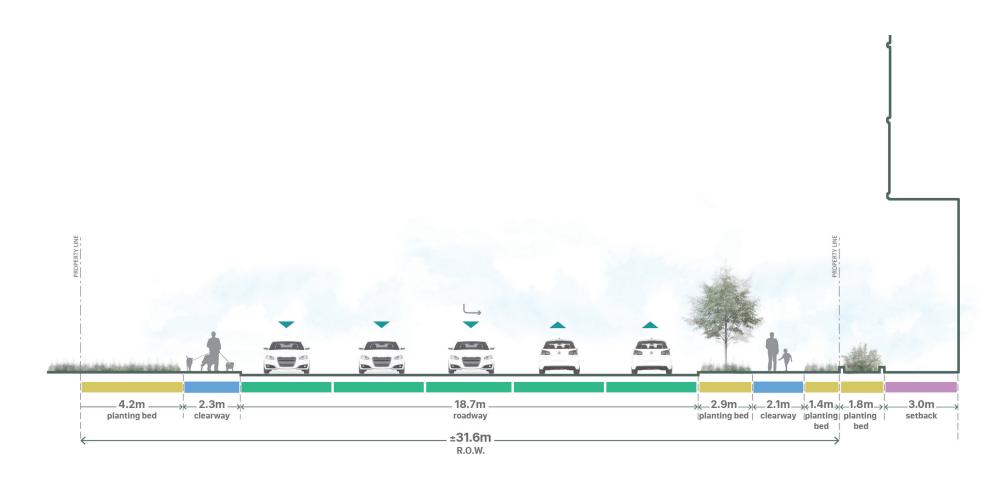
Section CC - Lawrence Avenue East - Proposed Condition
